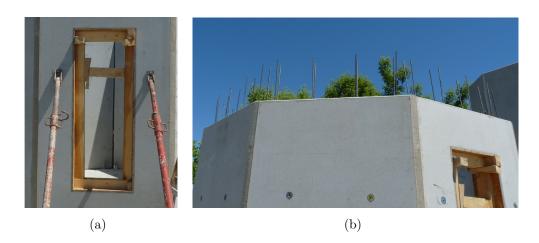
Segment 1 with (a) the brand door opening and (b) the horizontal joint reinforcement
